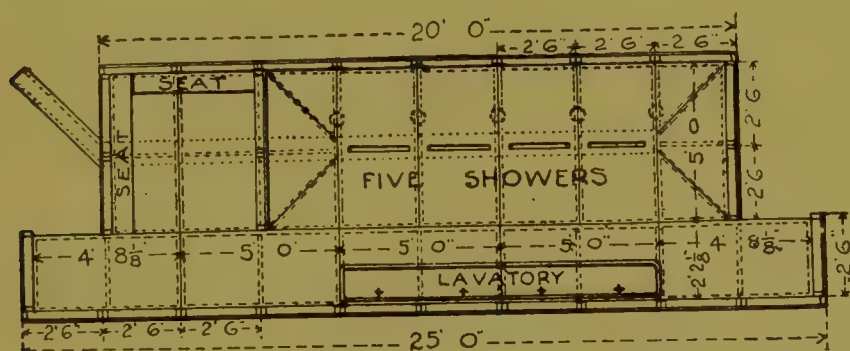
Ground plan of field lavatory. Knock-down system.
